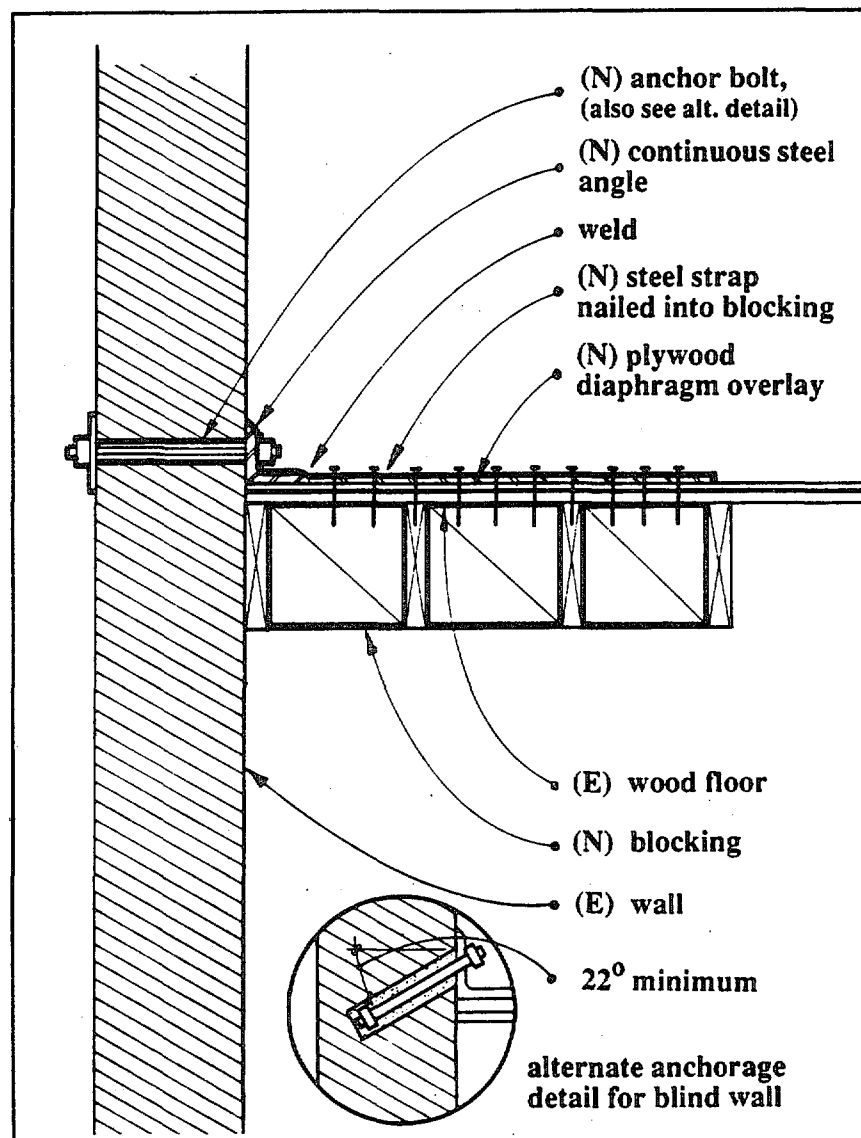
Strengthening out-of-plane connections of a wood diaphragm.
